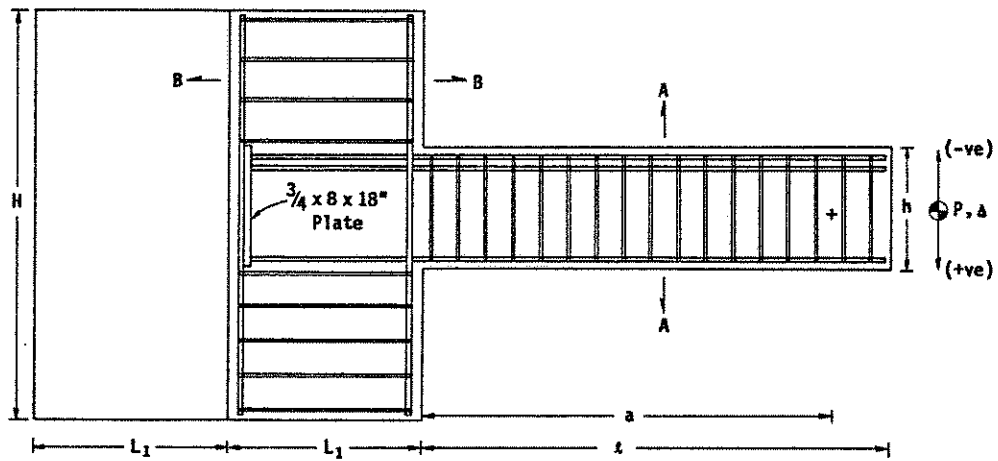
Schematic Diagram of Test Beam showing Details of Reinforcement
